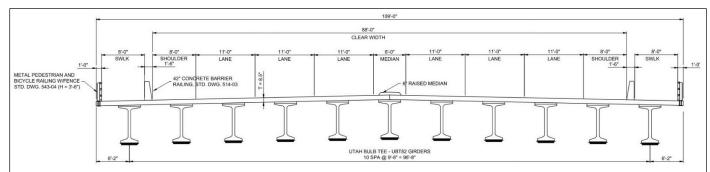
, Proposed Typical Section for Alternative Using UBT 82 Girders
